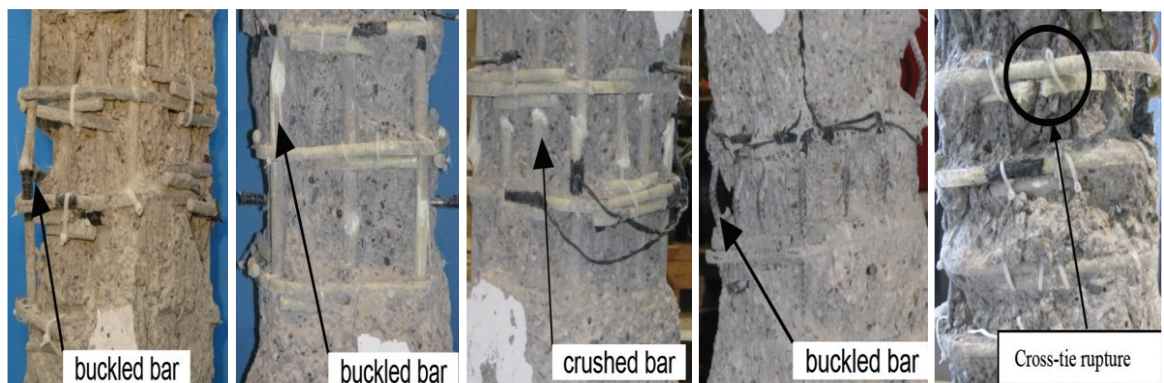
Possible failure modes in the specimens (Tobbi et al. 2014a).
